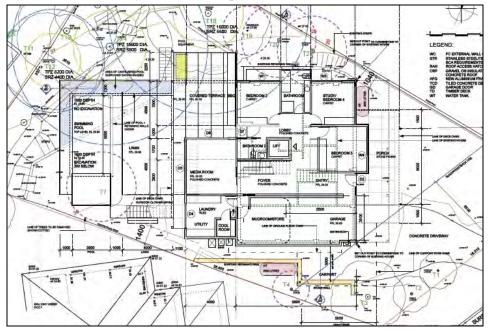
The proposed site plan. (Source: Proposed Plans by Atelier Halefeli Architects, revision A, dated 18/08/22)
